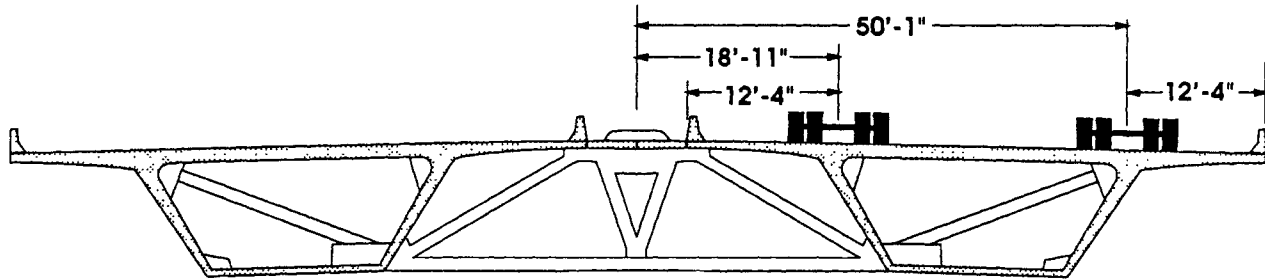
Cross Section of Twin Box Girder Showing Transverse Locations of Test Vehicle.
